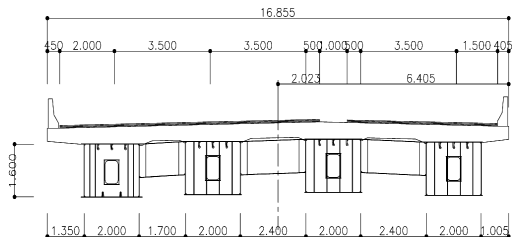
Section view of the steel box girder bridge (unit: mm)
